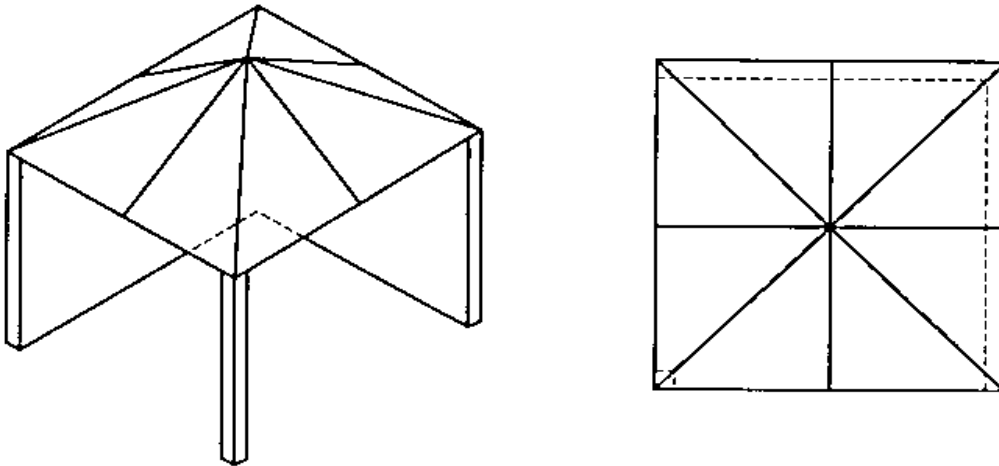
OUTDOOR AREA – EXAMPLE 3
